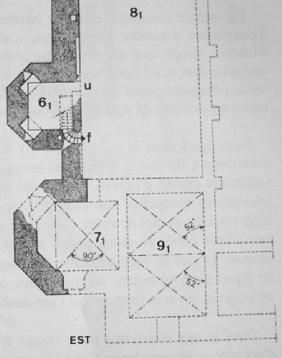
(top) castle floor plan; Fig. 3 (above) Amelie tower ceiling; Fig. 4 (right) First floor showing chapel, room 91
